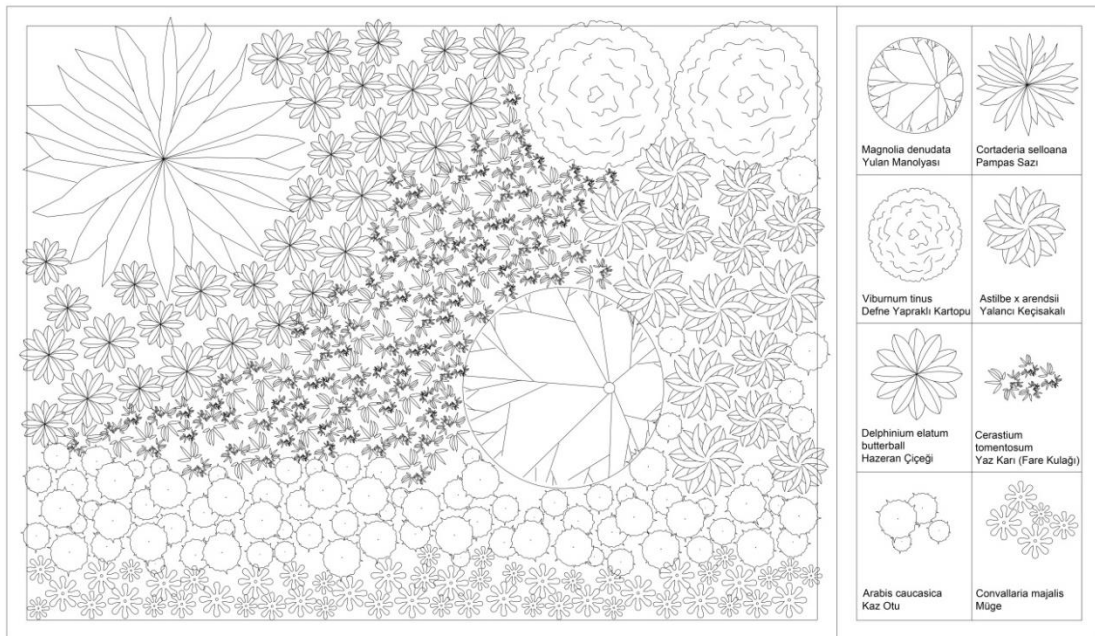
Planting design plan with white color effect (Scale: 1/40)
